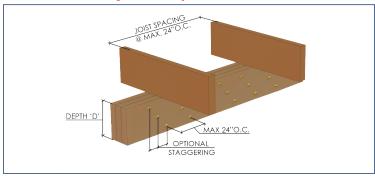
Multi-Ply Beam with One Face Loaded
